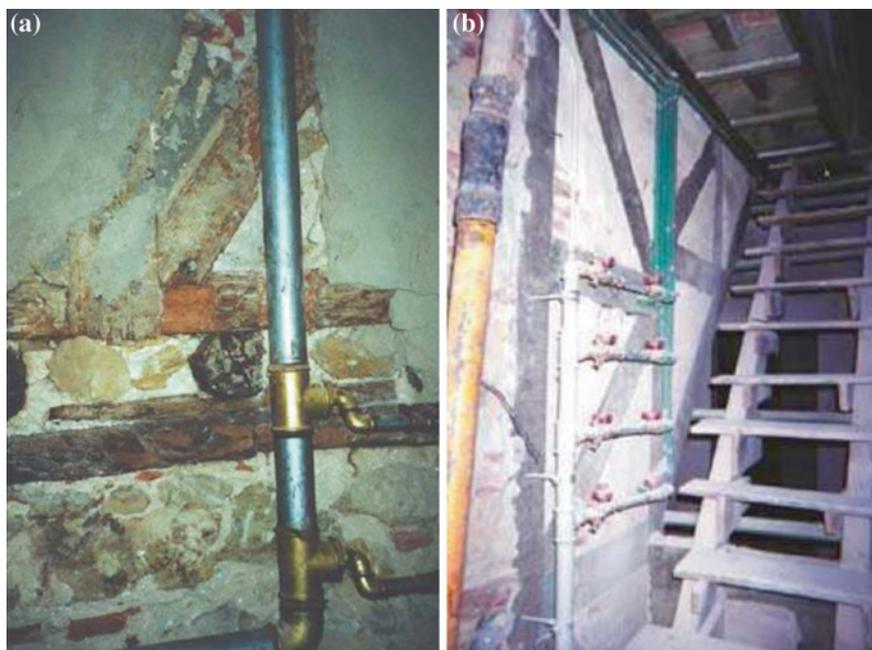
a Cut in frontal wall to introduce pipes and b pipes crossing wall in the perpendicular direction [20]
